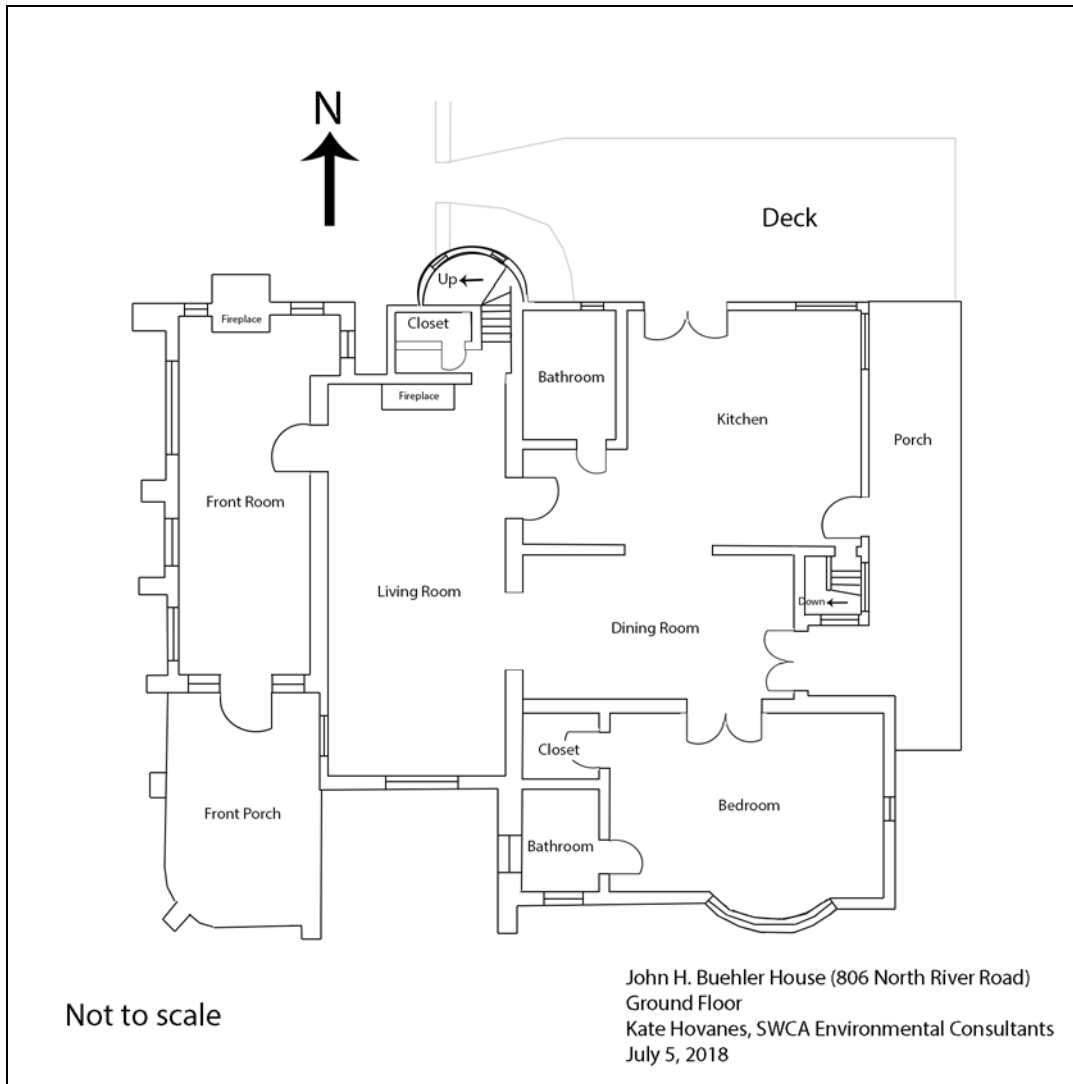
Sketch plan of Buehler House, ground floor. Not to scale.
